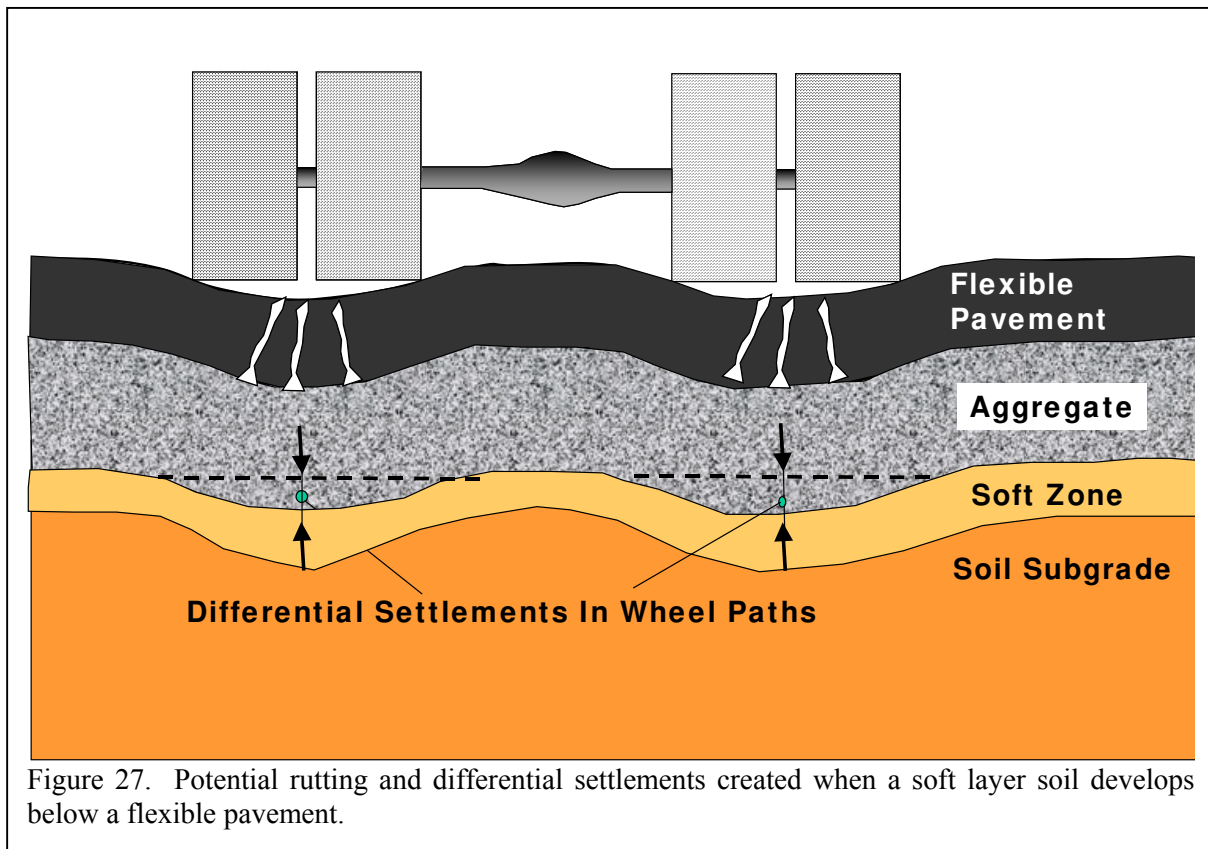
Potential rutting and differential settlements created when a soft layer soil develops below a flexible pavement.
